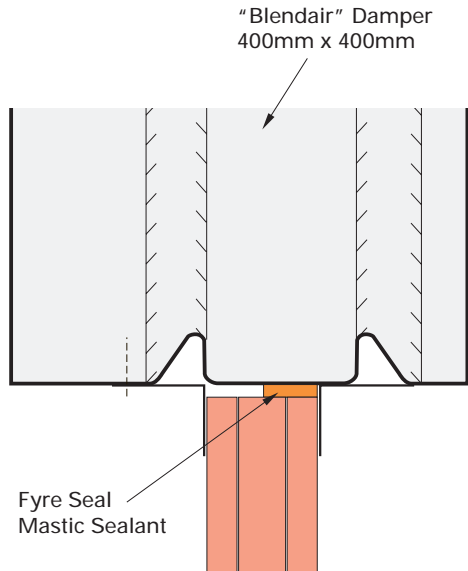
Damper Penetration Detail (bottom) FRL NA/120/0
